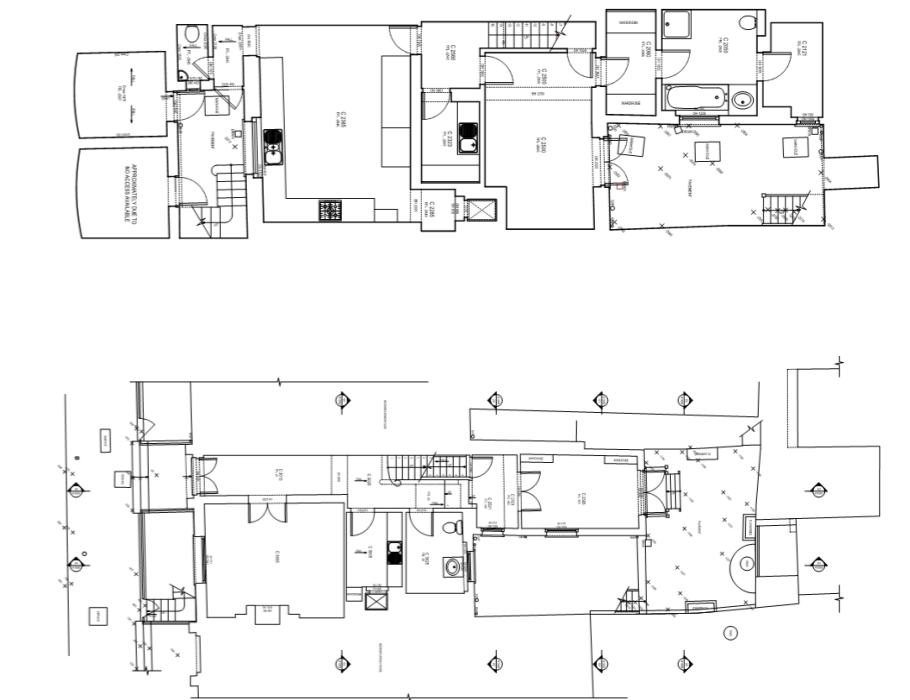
Existing building's Lower Ground and Ground Floor Plans
